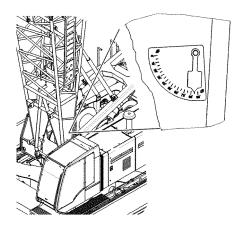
Mechanical boom angle indicator on boom base section or A-frame 1
